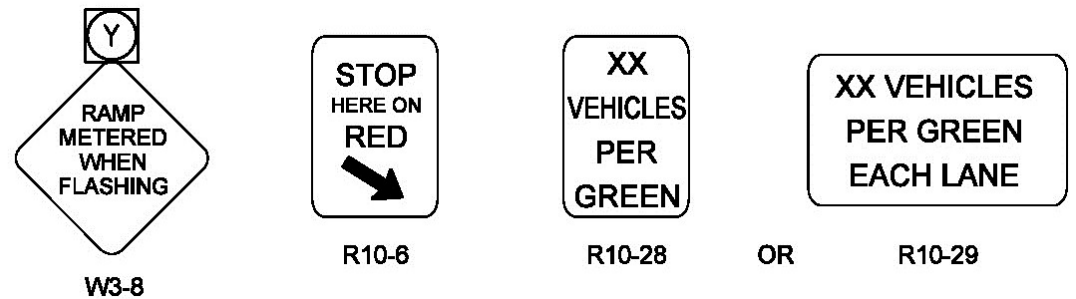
Non-Freeway-to-Freeway Ramp Meter Signing and Pavement Markings
